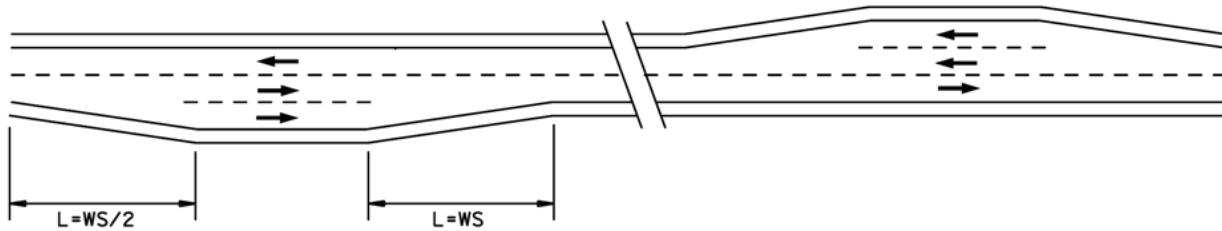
Separated Passing Lanes with Widening to the Outside of Roadway (Figure 4-4 in the RDM [7]).
